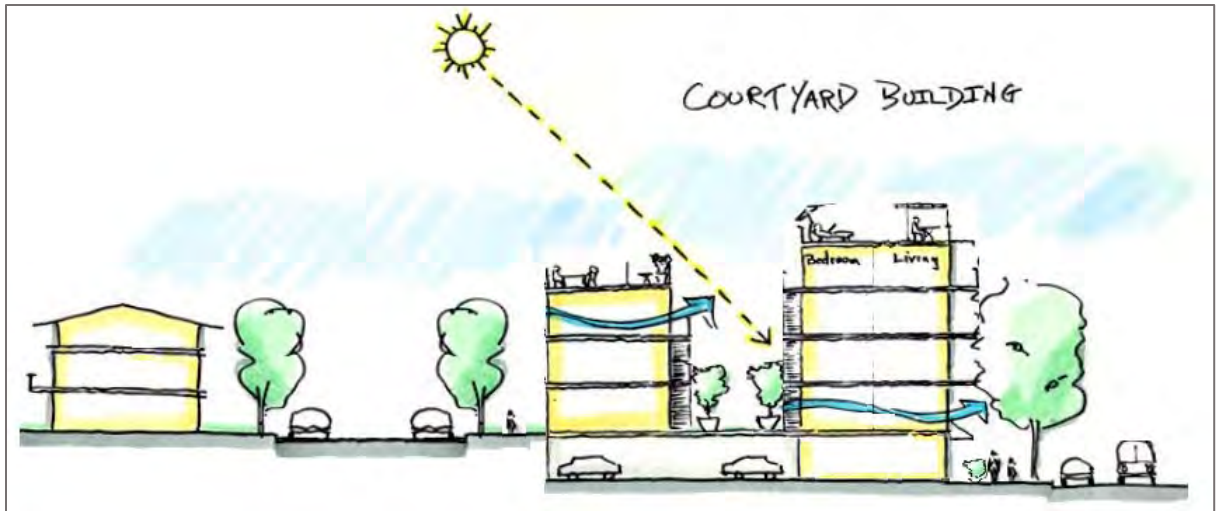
Example of a double-frontage lot with two people-oriented building frontages at street level. Changes in grade can be used to create positive interfaces with the street and transitions in scale and facilitate underground parking.
